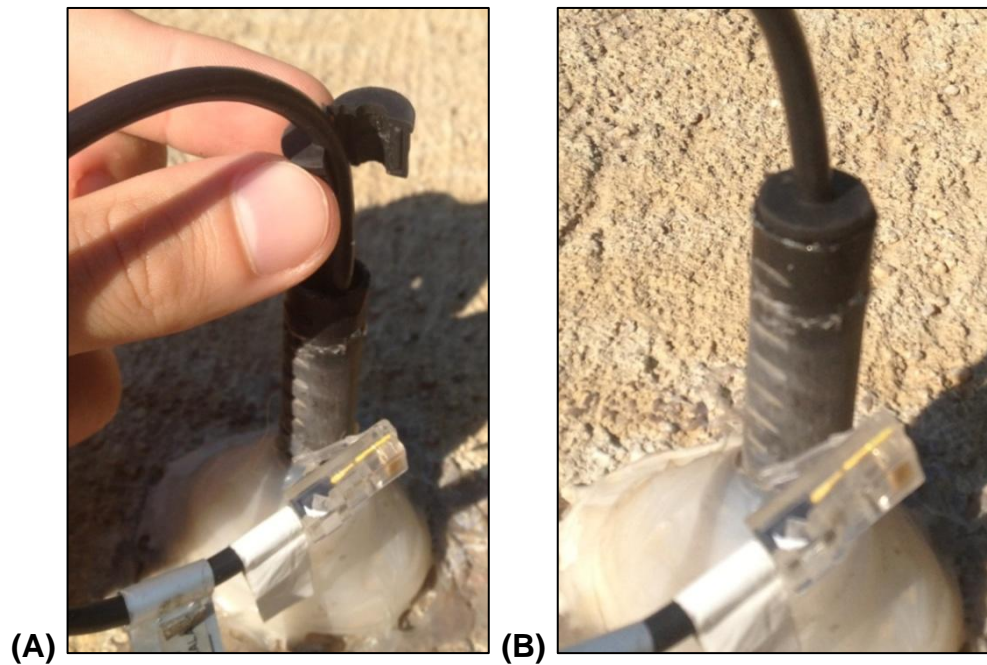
(A) Putting rubber plug around cable and (B) sliding it into tube
